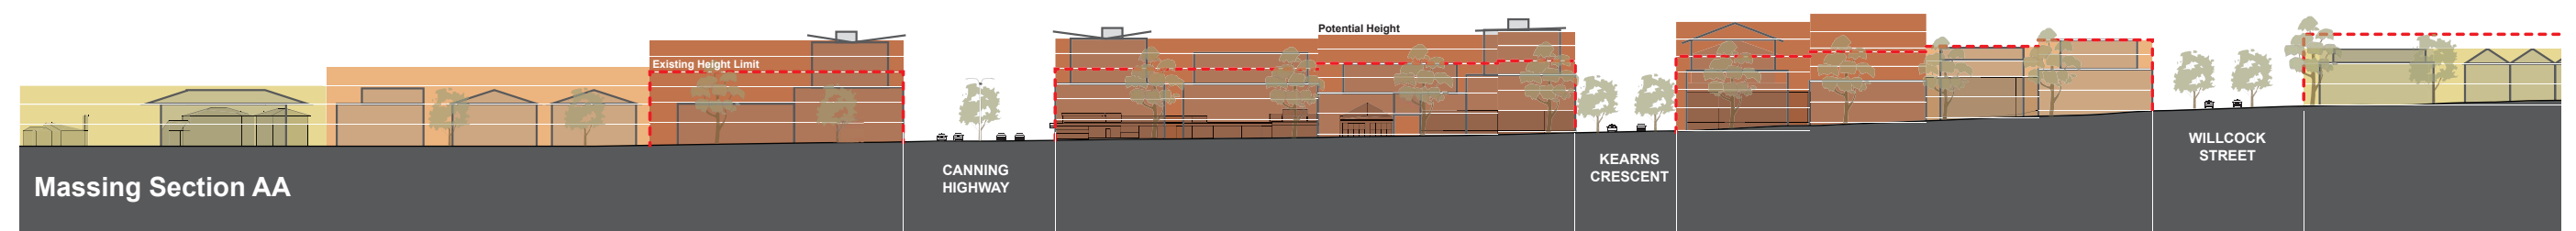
Section depicting proposed height envelopes and indicative building forms that may occur within them.
